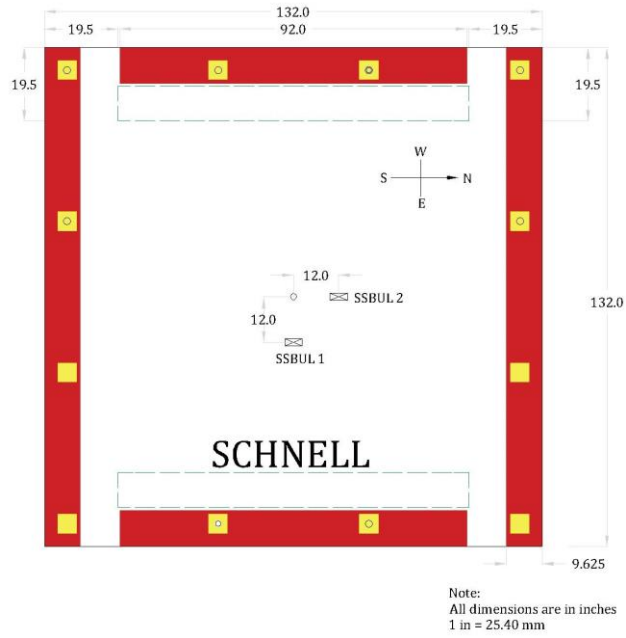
Steel Strain Gauge Location for Slab Specimen B
